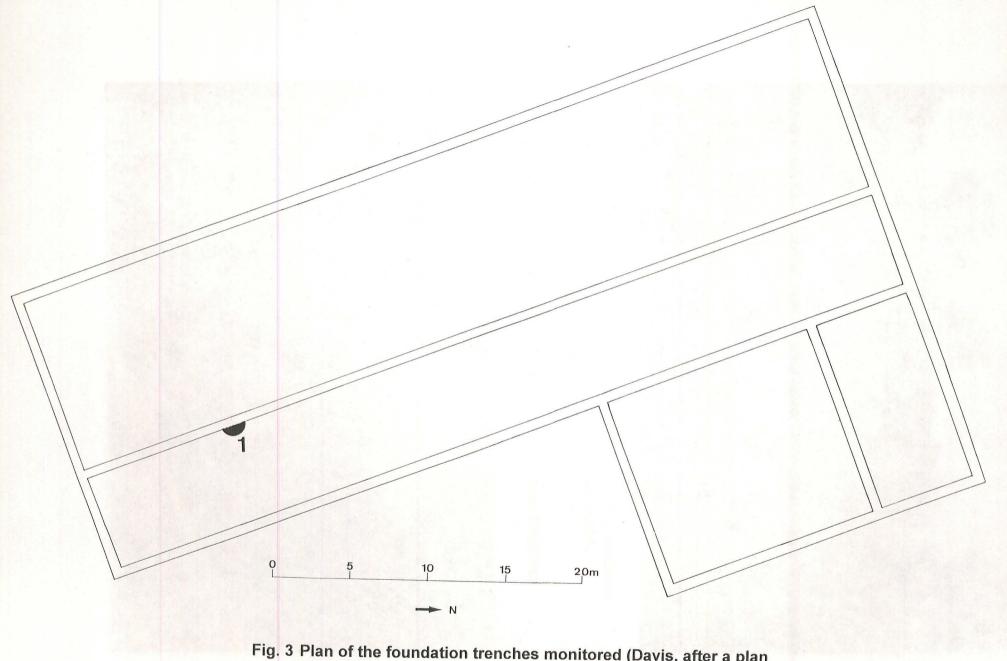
Plan of the foundation trenches monitored (Davis, after a plan supplied by the client).
